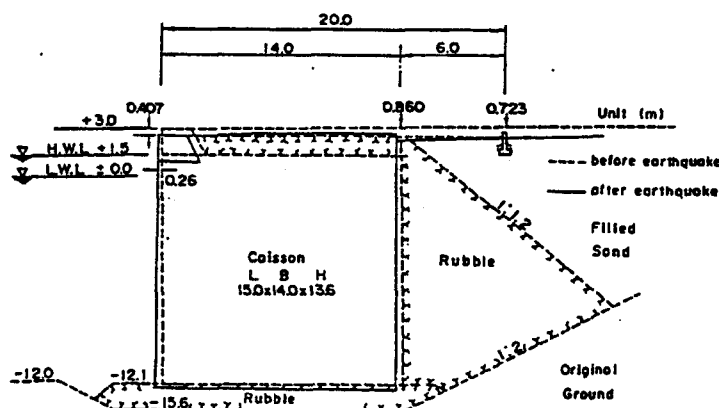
Typical cross section of quaywall at Site B (Iai et al., 1994b)
